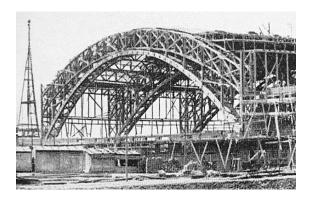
Westfalenhalle under construction (Tuchscherer 1933)
